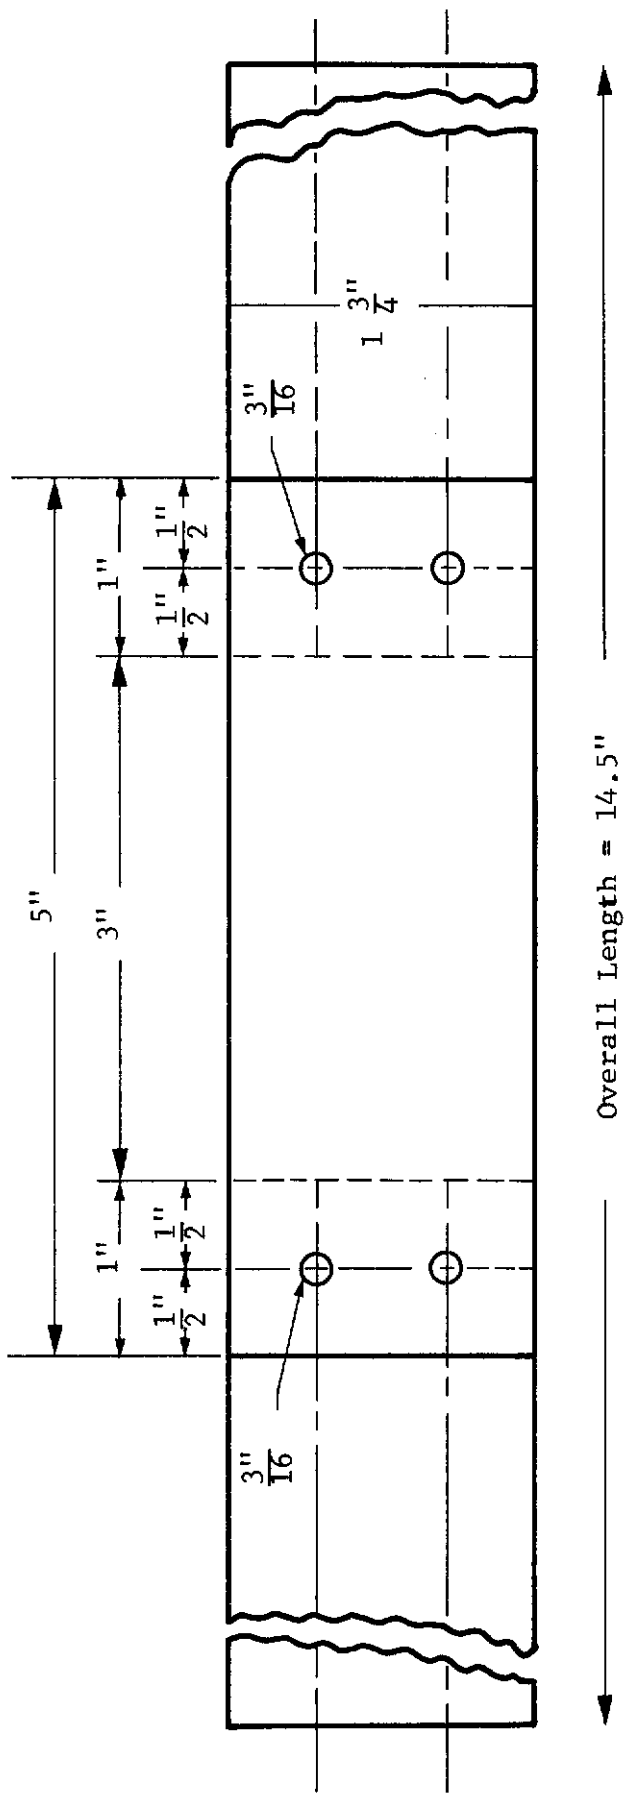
DIMENSIONS OF SINGLE-ROW DOUBLE-LINE BOLTED SPECIMEN
